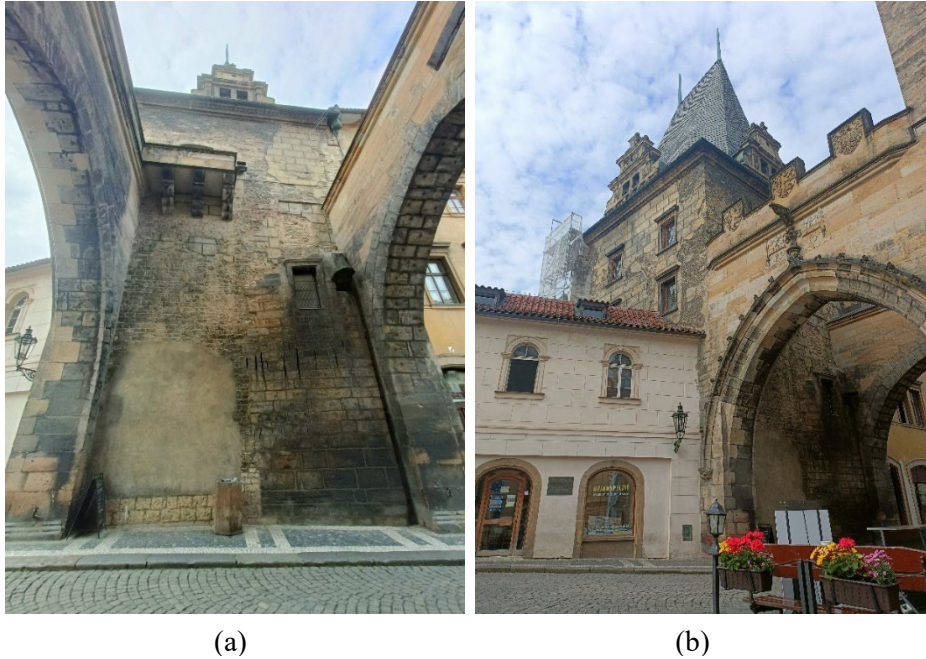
Photographic documentation – (a) Northern façade, (b) Eastern façade.
